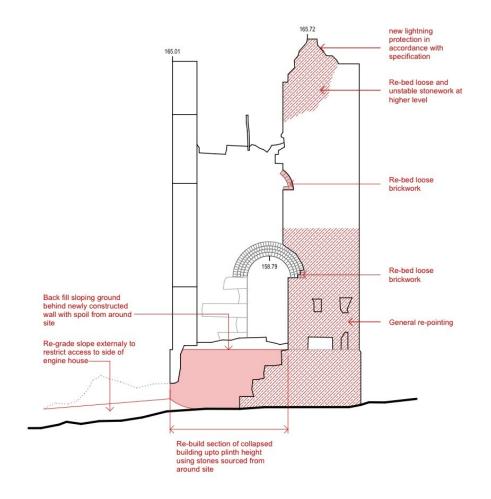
South west elevation of the proposed works to the Stamps engine house (PdP Green Cons. Ltd Dwg No. 4514B)
